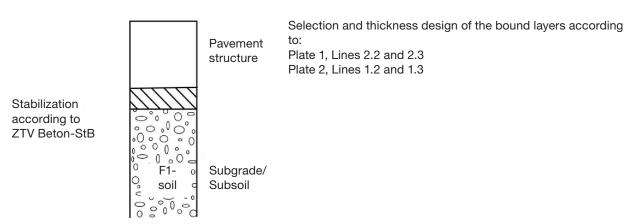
Structures on F1-soil with stabilization according to ZTV Beton-StB
